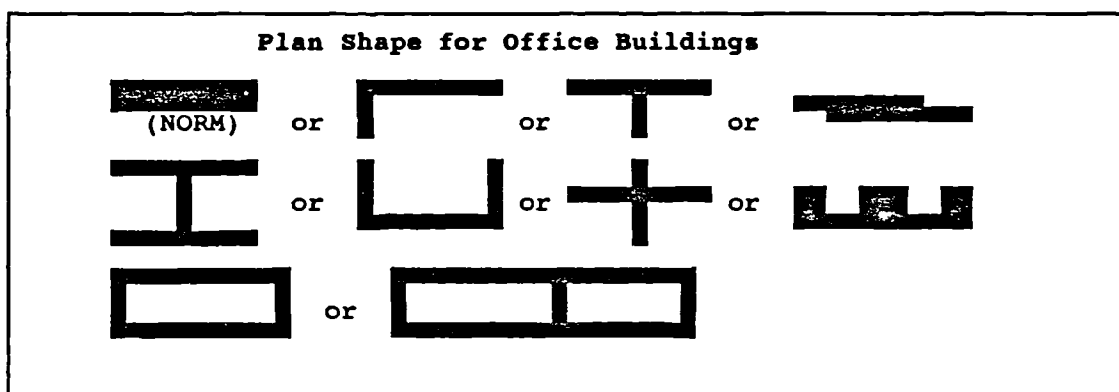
Alternatives and the Norm of Office Plan Shape
